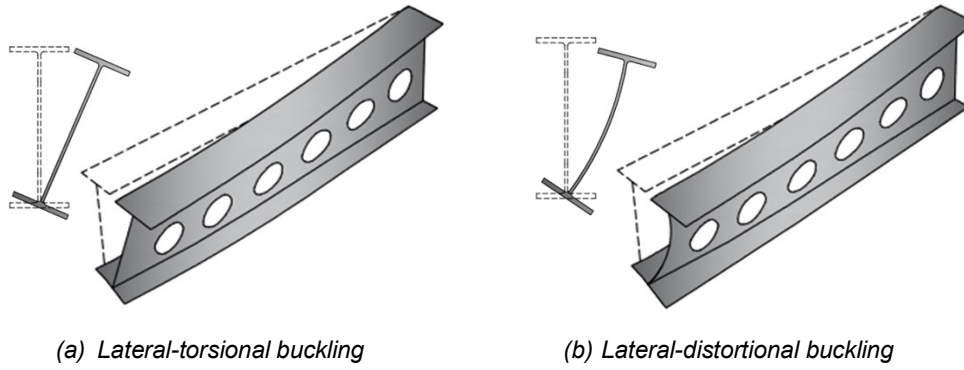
Global failure modes of beams with web openings under bending (adapted from [36])
